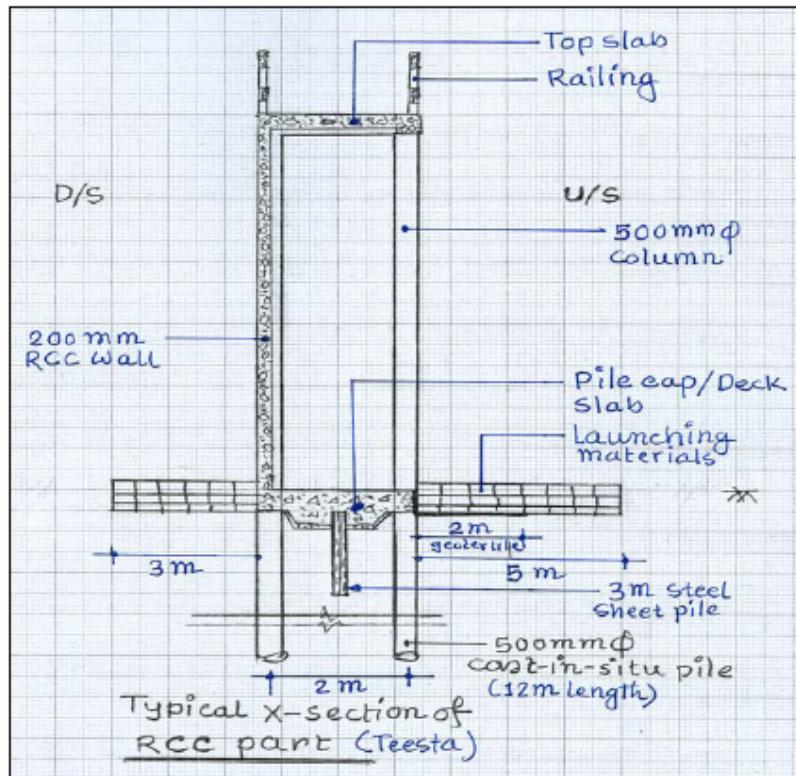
Typical cross section of RCC part (Source: Uddin 2007)
